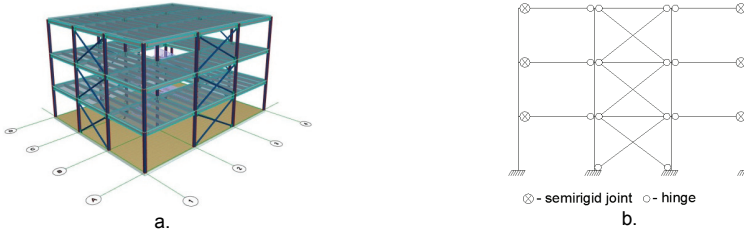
Reference structure (a) and structural model frames with bracings (b)
